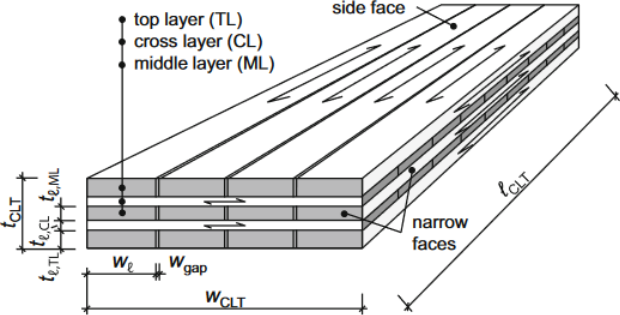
Technical drawing of a CLT element (Brandner, et al. 2016)
